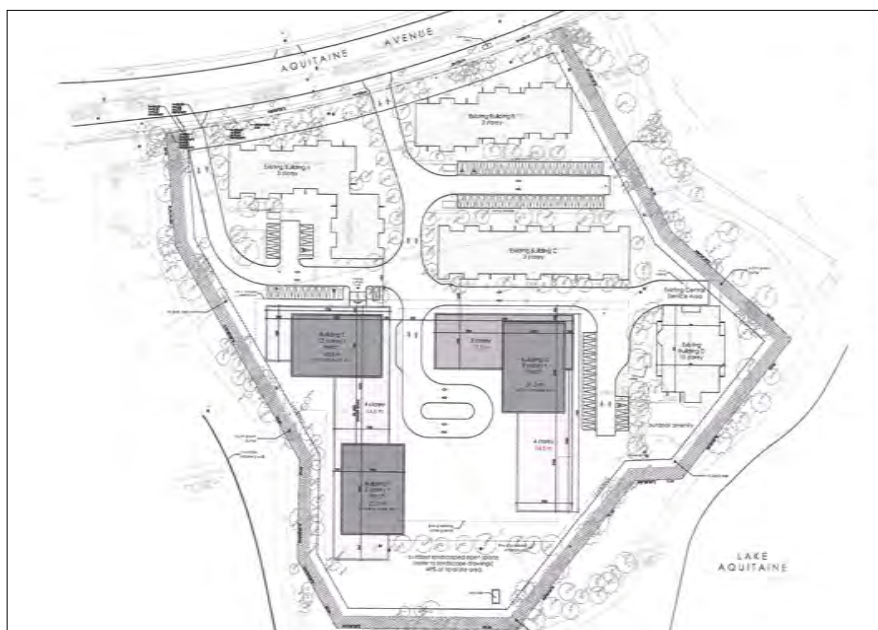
2700 Aquitaine Ave: Site plan showing proposed development.
